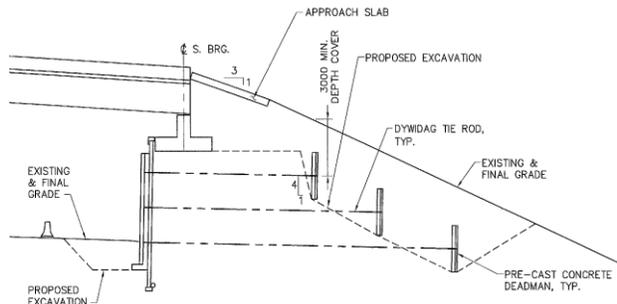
Typical detail of deadman installation for retrofit of a MSE abutment wall at wildlife crossing.
